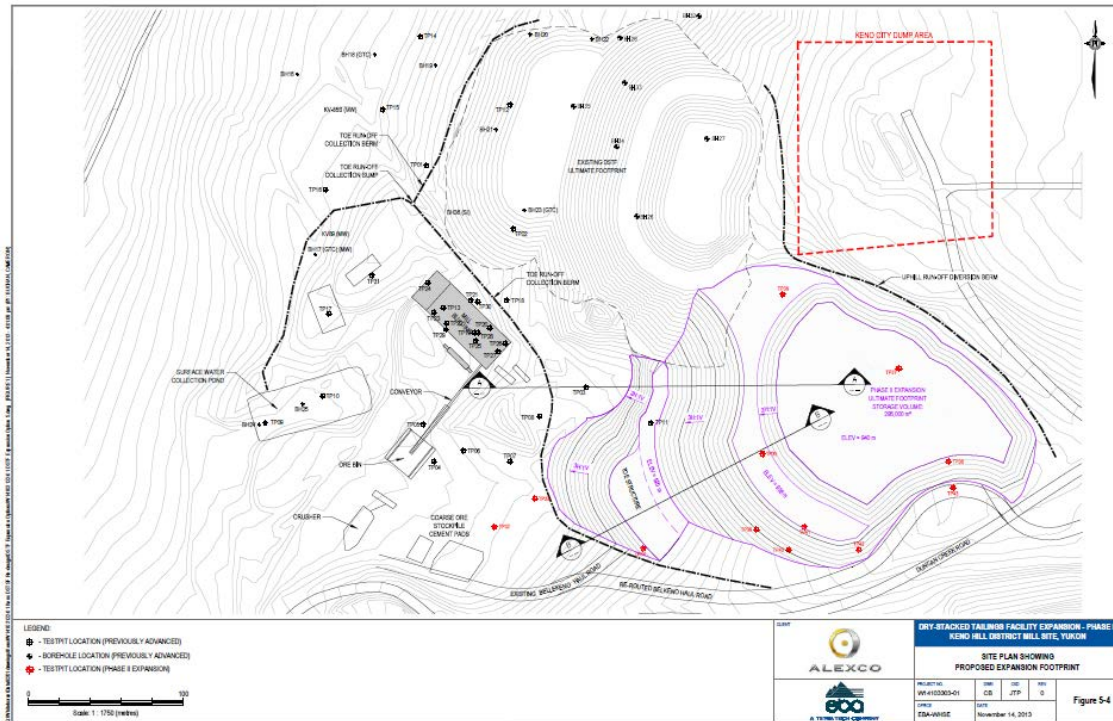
Engineering site plan of expanded DSTF footprint showing re-routed Bellekeno Haul Road.¹³
